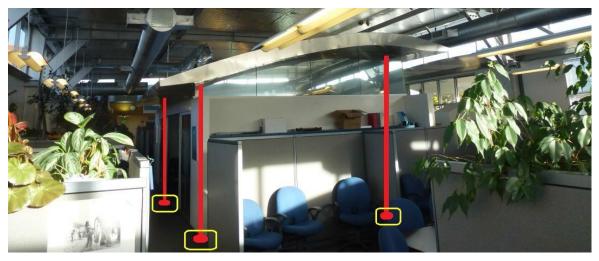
Field Services Building – Conference Room Column Base Retrofit
